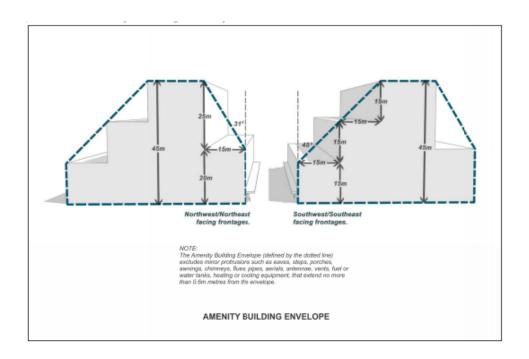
Amenity building envelope Replaced with new diagram shown below footnotes
